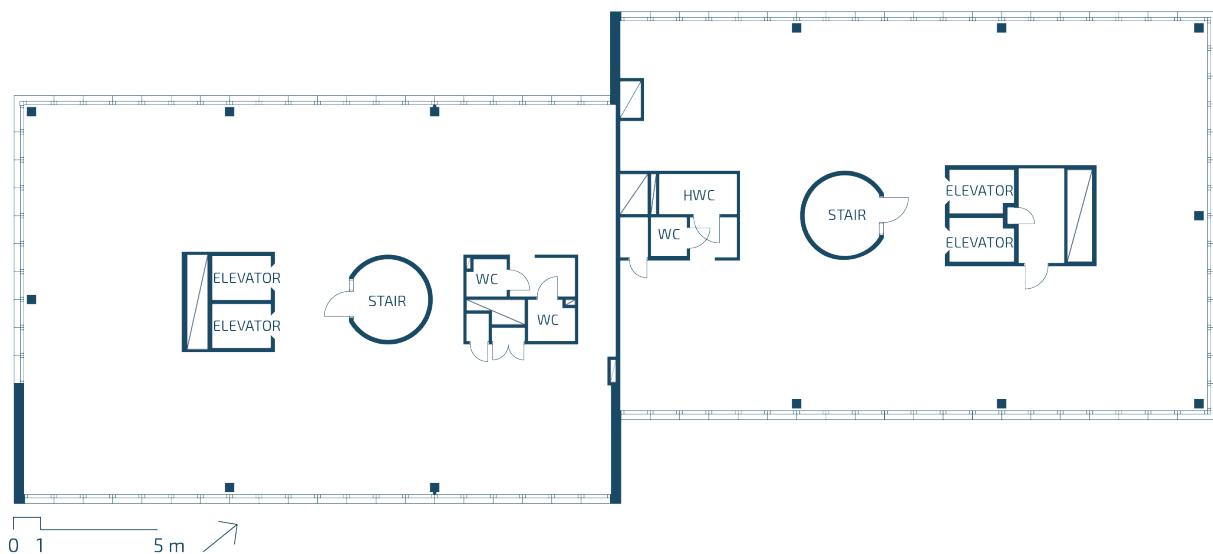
Load-bearing elements, adapted from Eriksson (2024)
